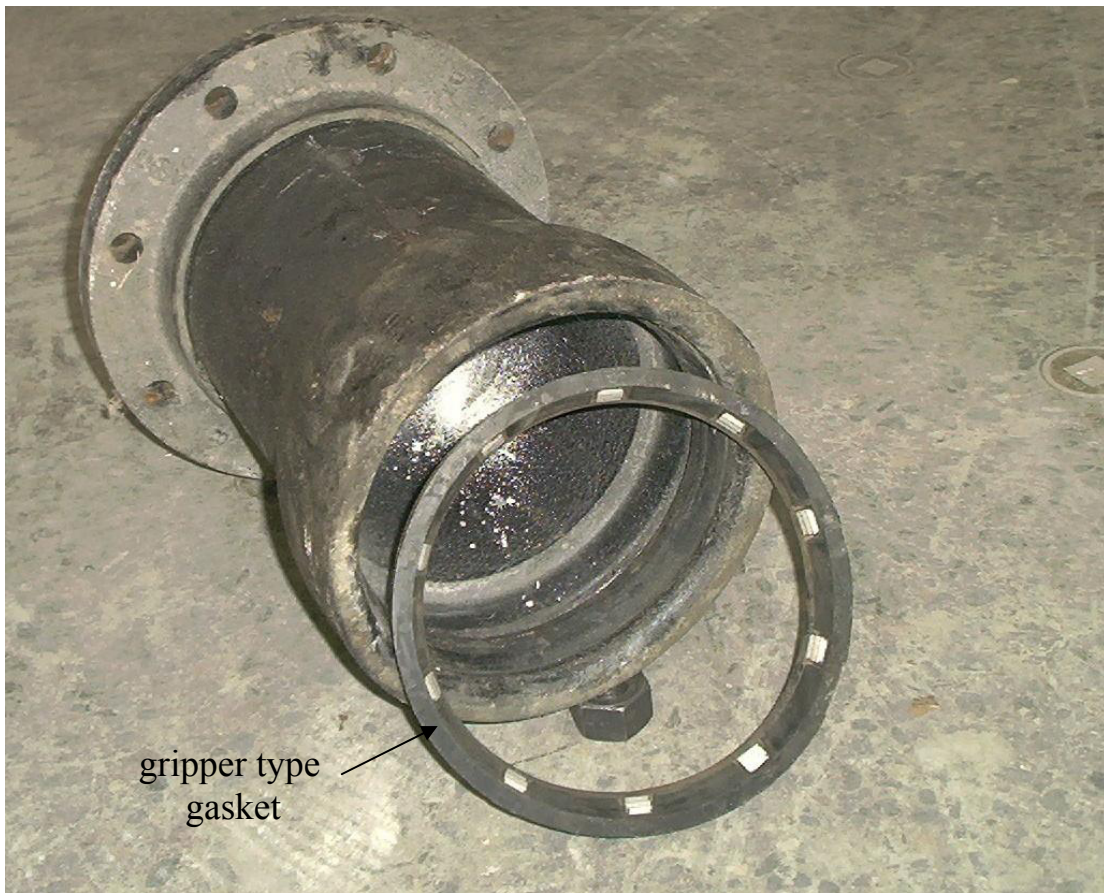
Ductile Iron Pipe with a Gripper Gasket Joint
